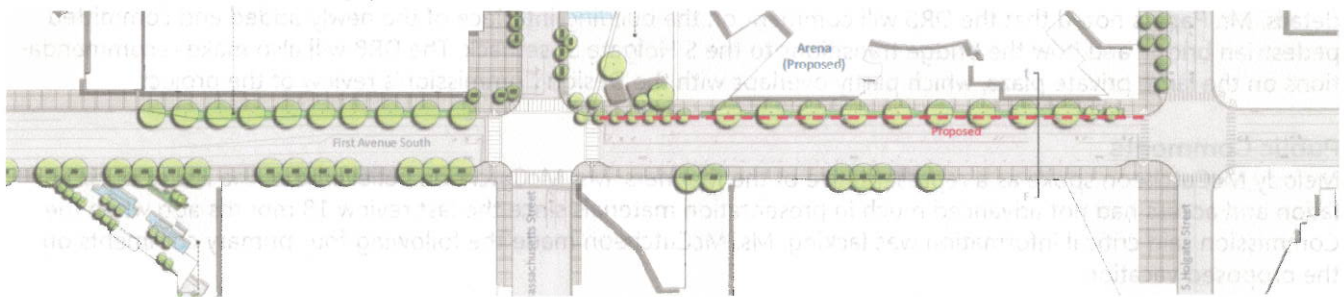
Excerpt from Stadium District Study Street Concept Plan for 1st Ave S between S Massachusetts St and S Holgate St
